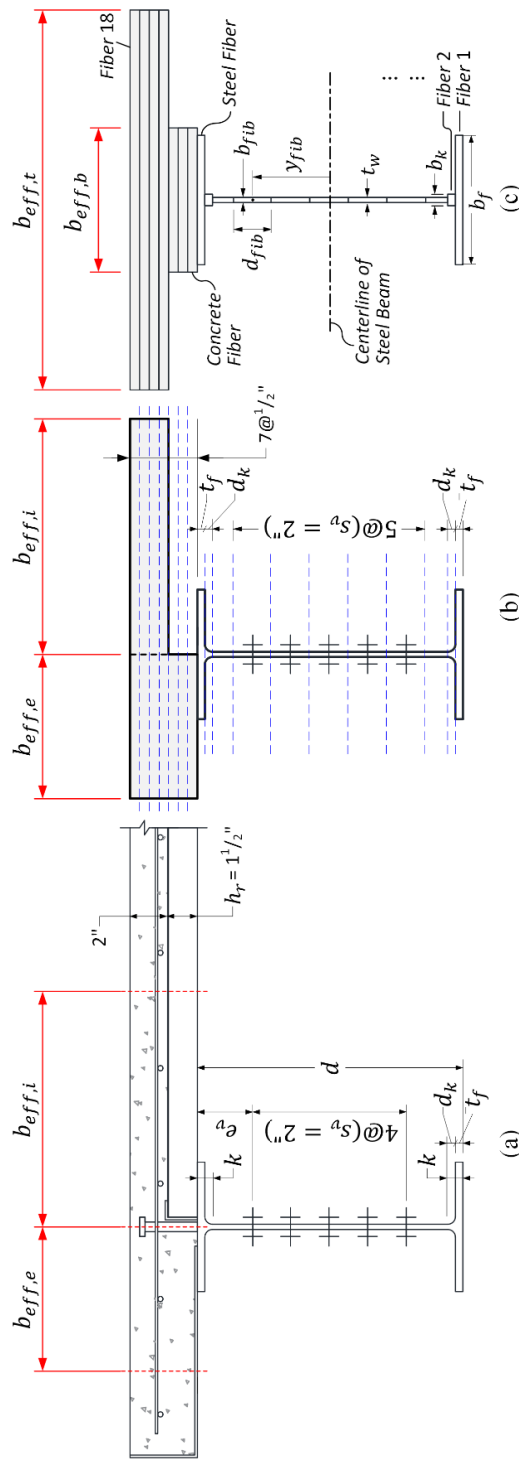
Collector in Frame S: (a) Cross Section Profile, (b) Composite Section Considered, and (c) Fiber Section Used for Member Forces Recovery
